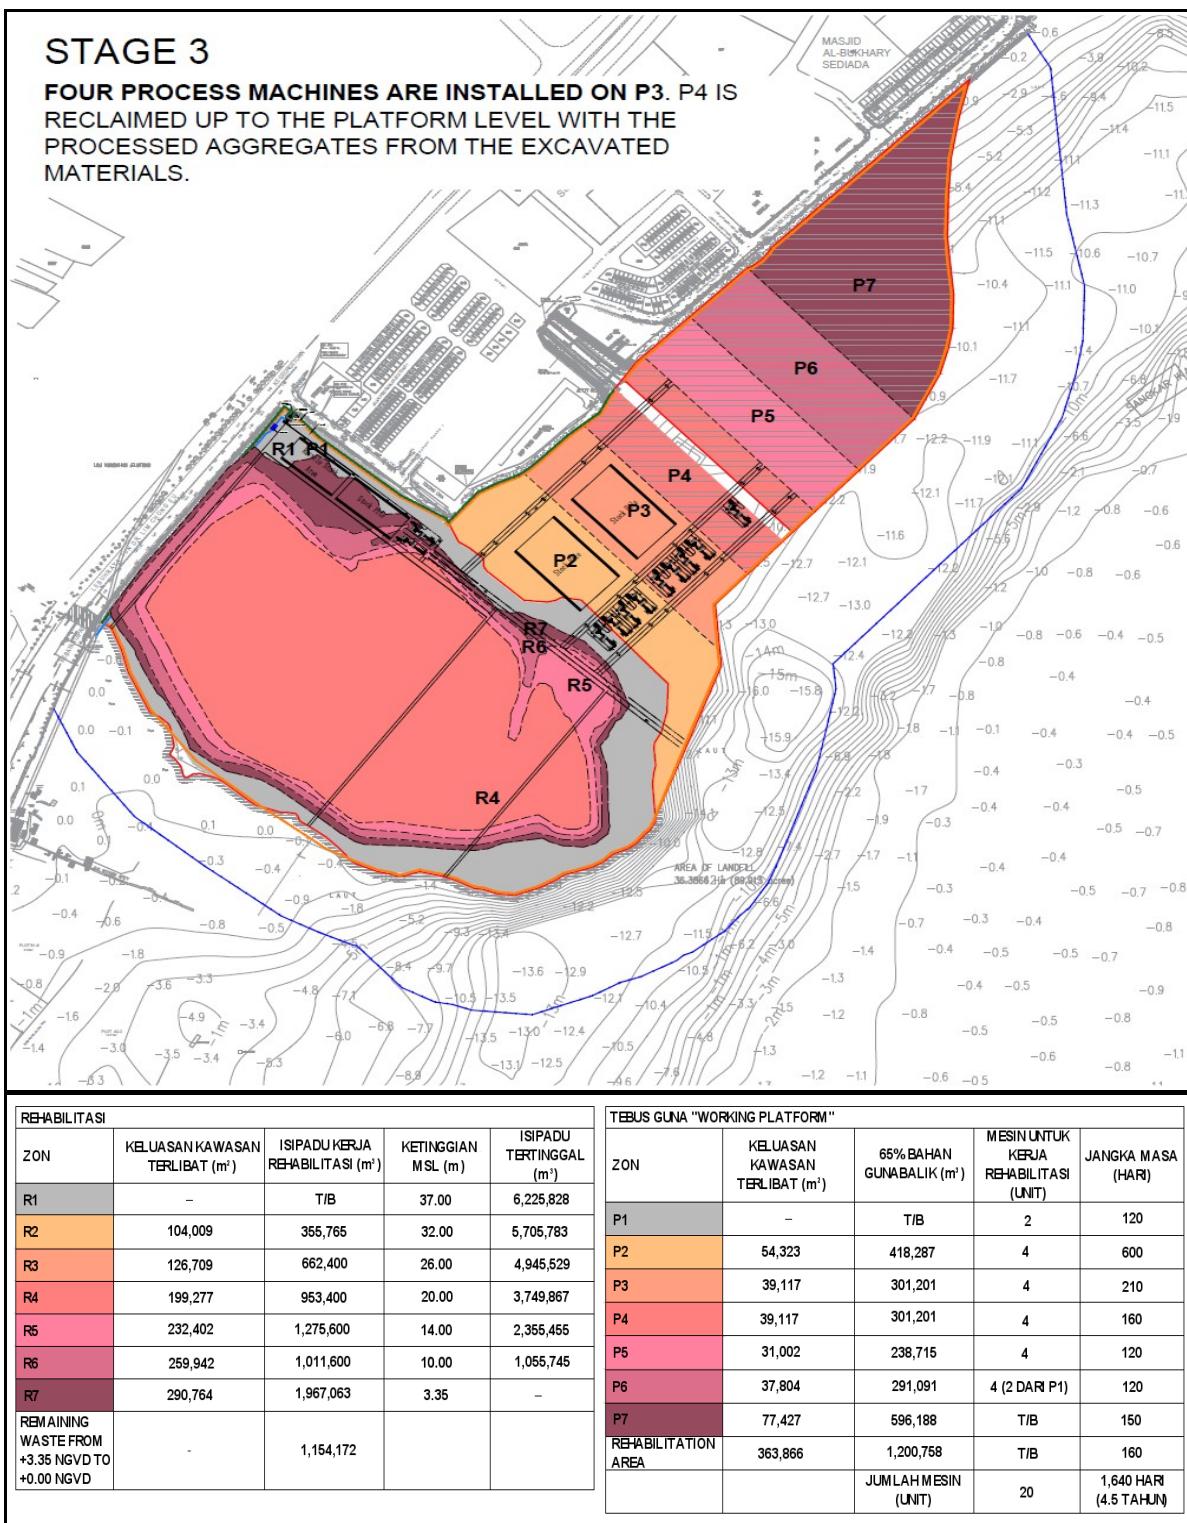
Layout Plan For Stage 3 Recycling Area On Jelutong Landfill
